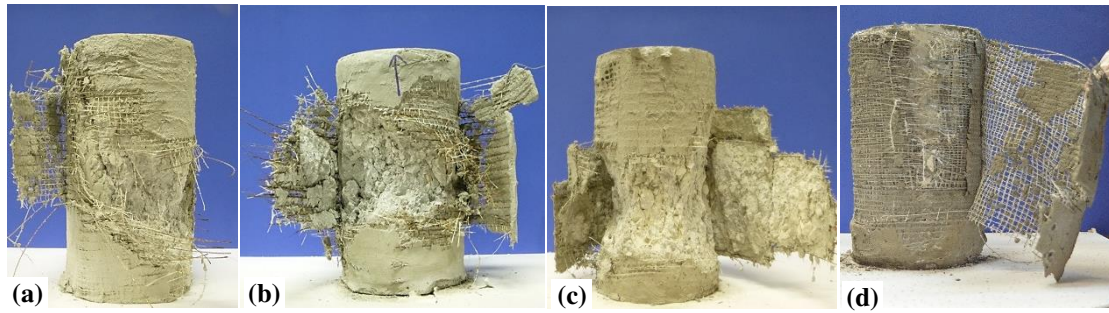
SRG jacketed specimens at failure due to tensile fracture of the steel cords of the fabric.
